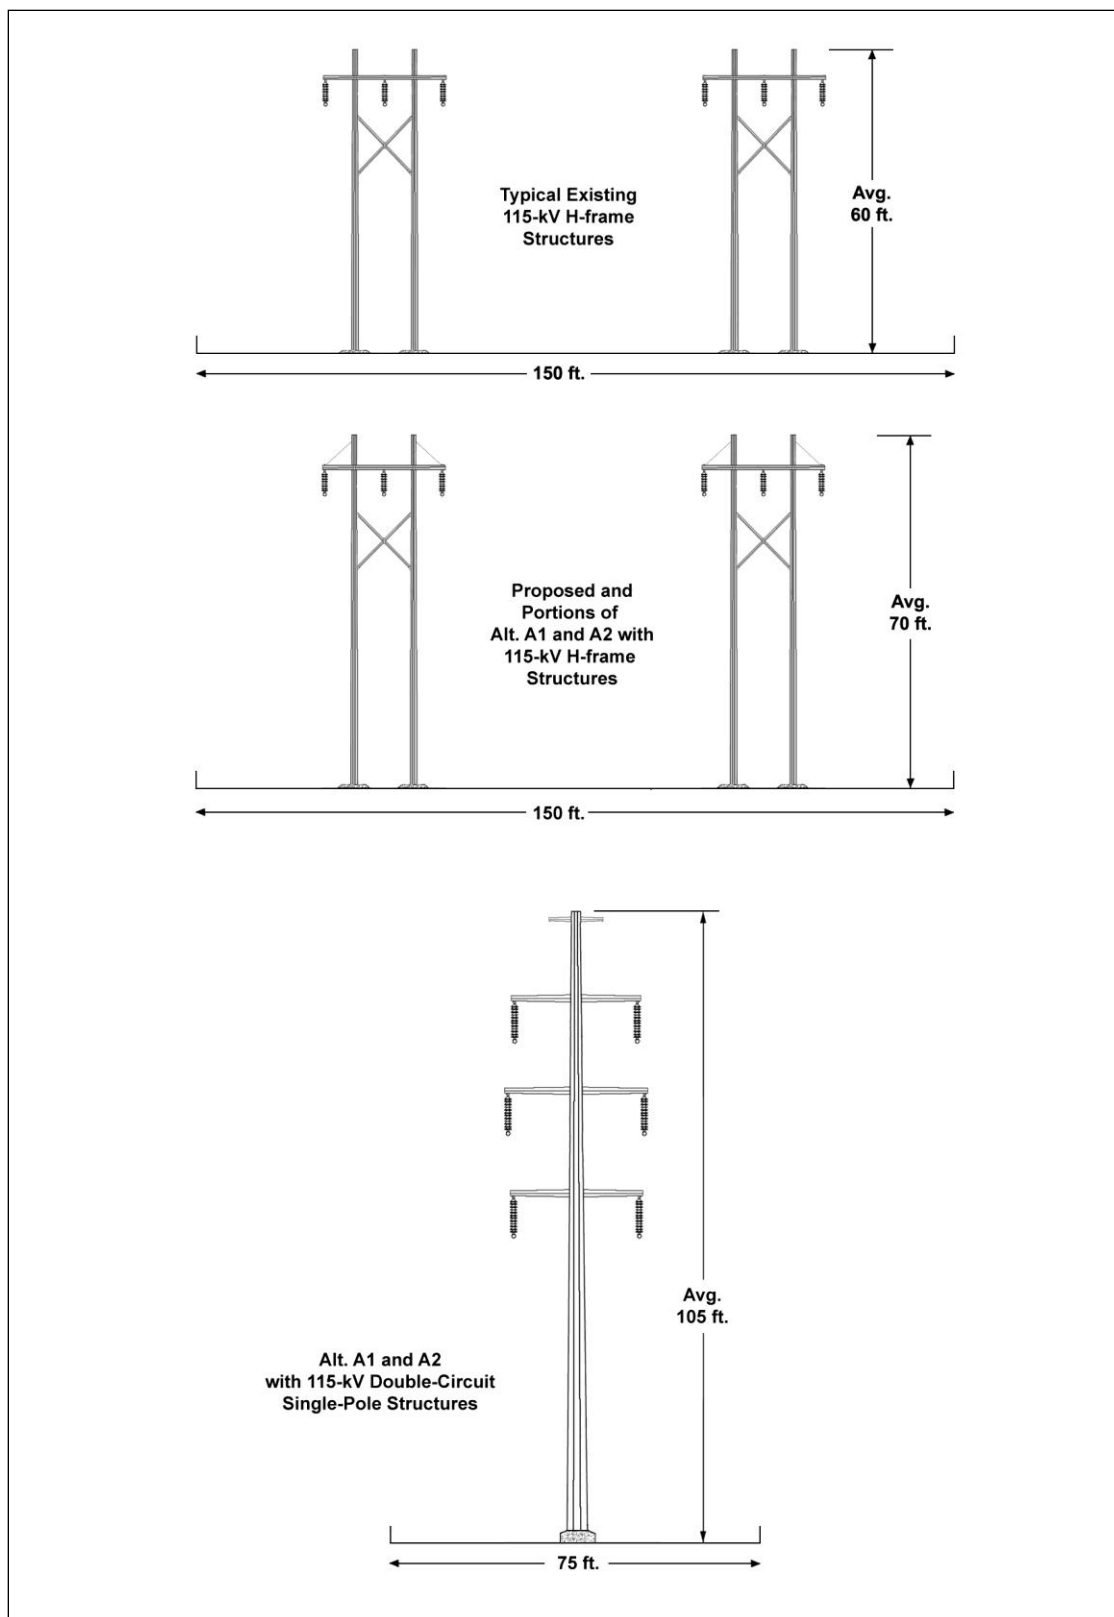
Cross Sections of ROWs with Structure Types for Proposed Project and Alternative A
